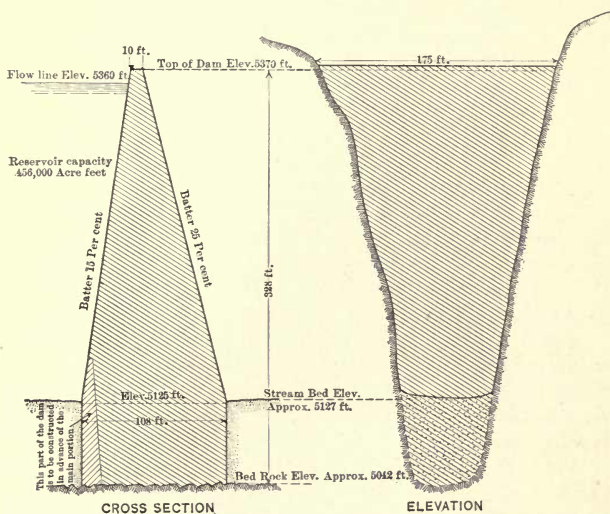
Section and Elevation of Shoshone Dam, Wyoming.
